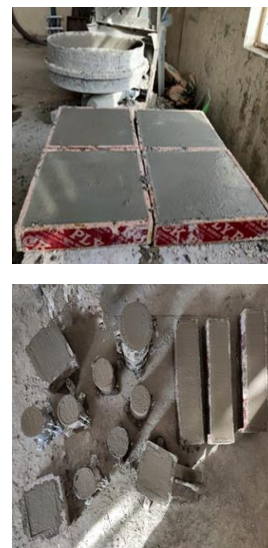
Bubbled Reinforced Concrete Slabs and control specimens Casting
